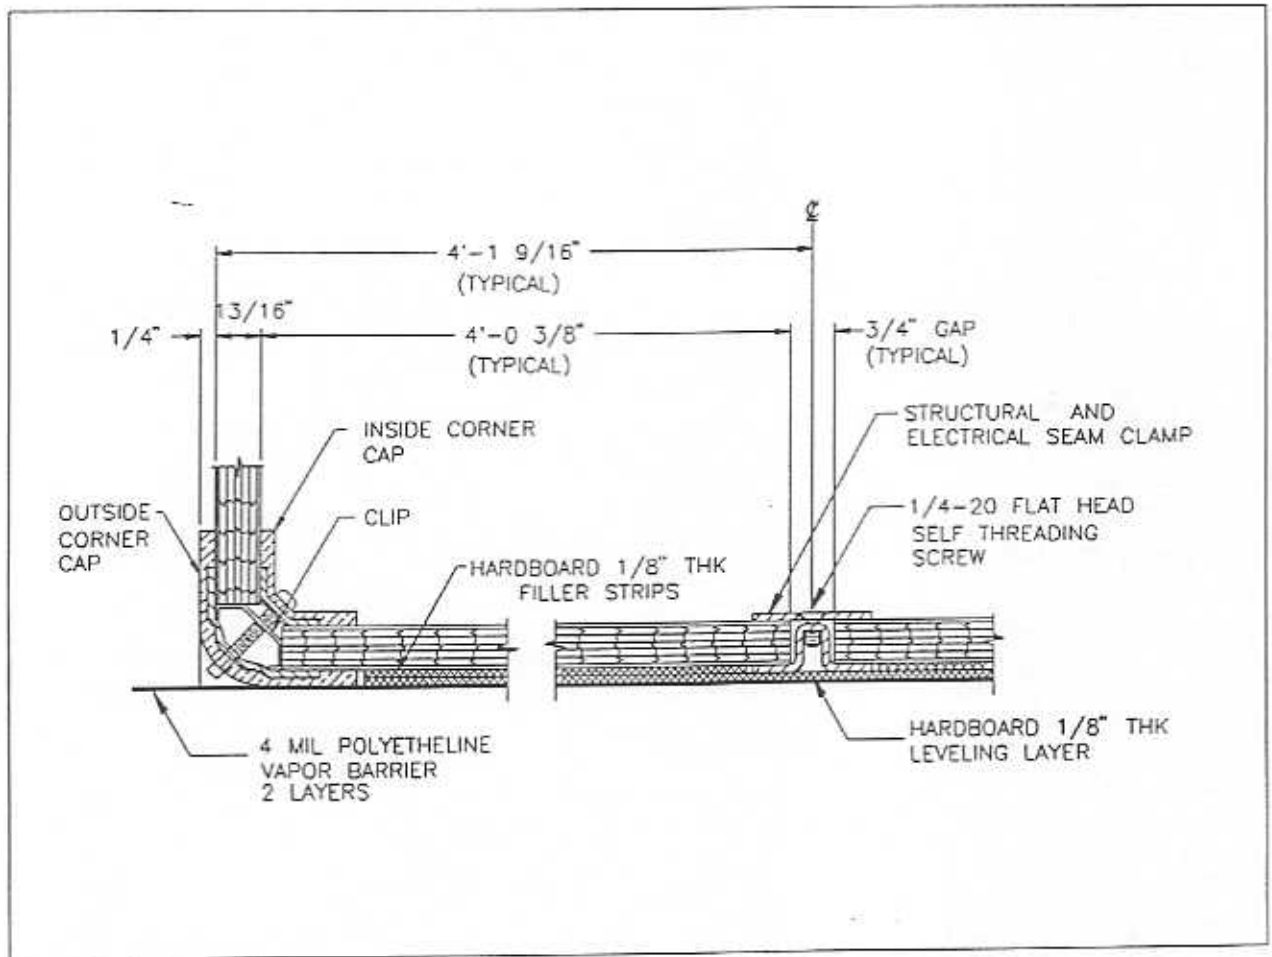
SECTION @ FLOOR/WALL CORNER
